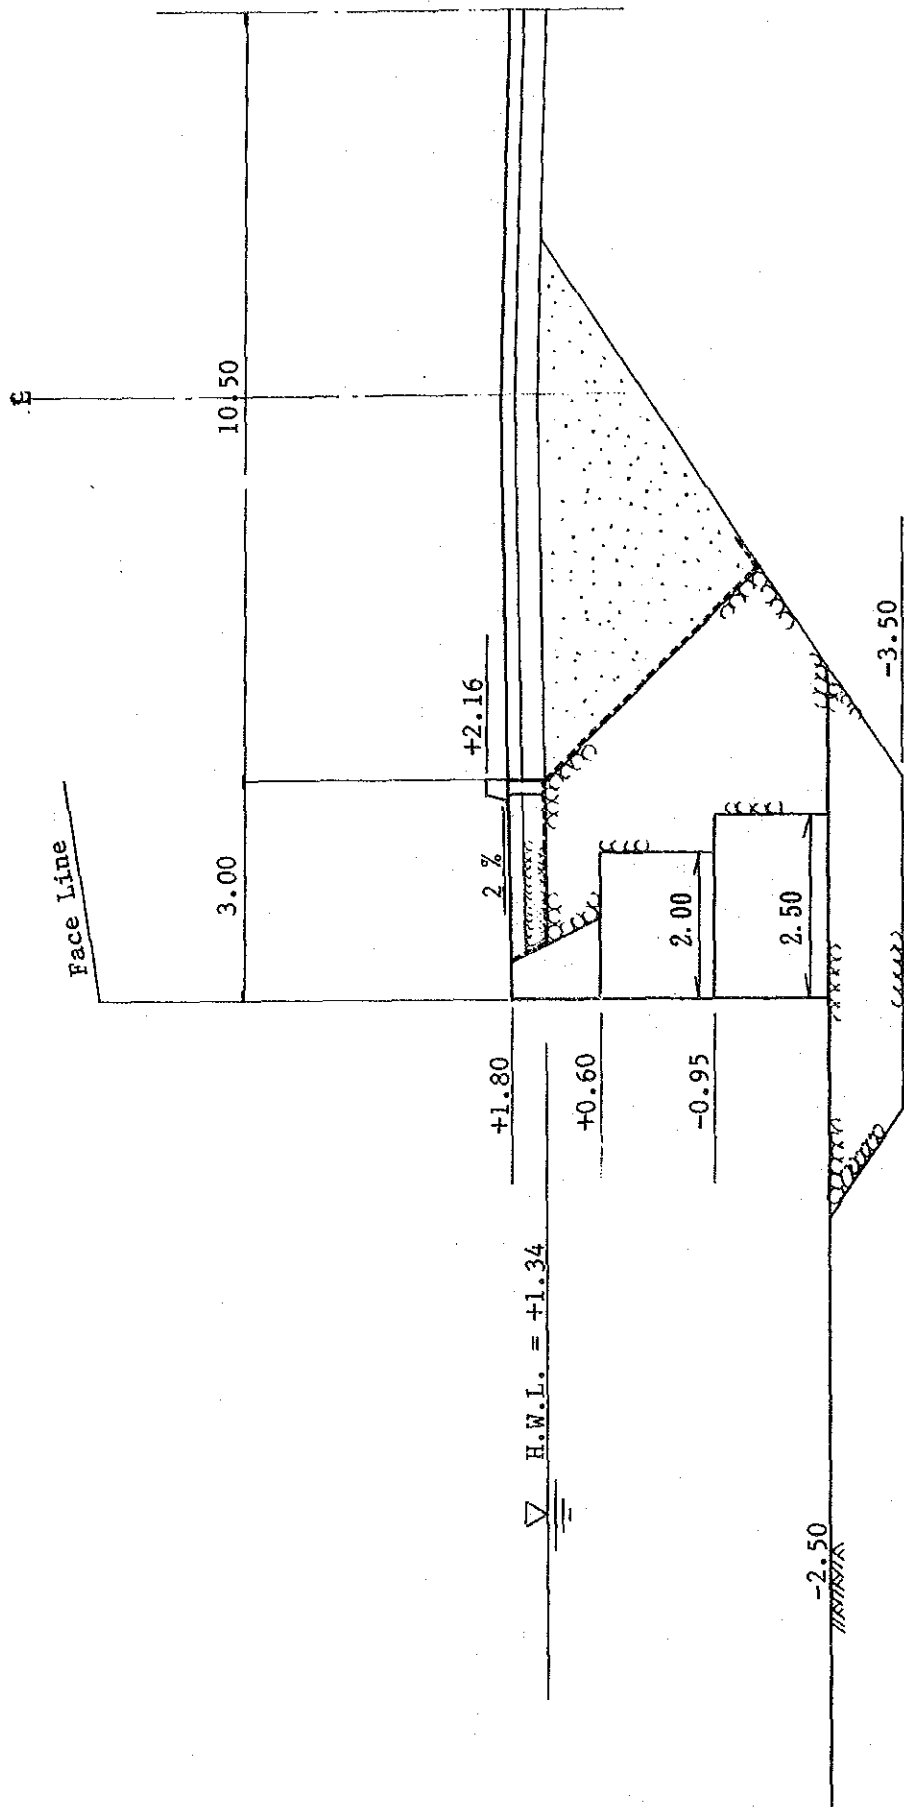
Typical Section of South Coast : West Quaywall (S=1:100)
